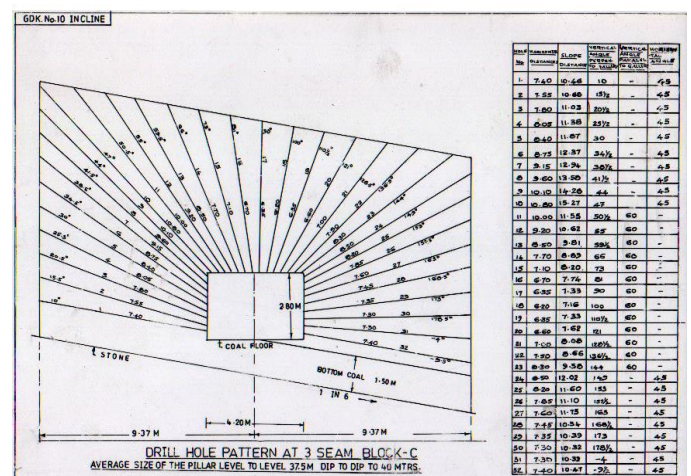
Long-hole drilling pattern for blasting in ring hole pattern
